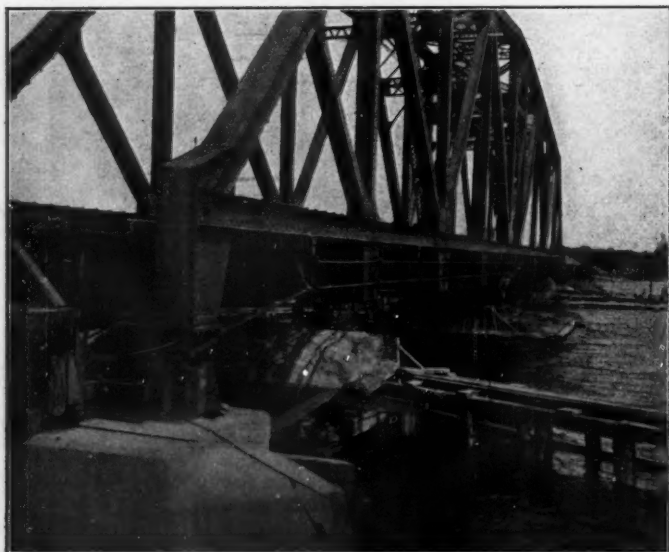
New Span in Place on Completed Rest Piers, Showing Construction of Center Pier and Protection Work.
